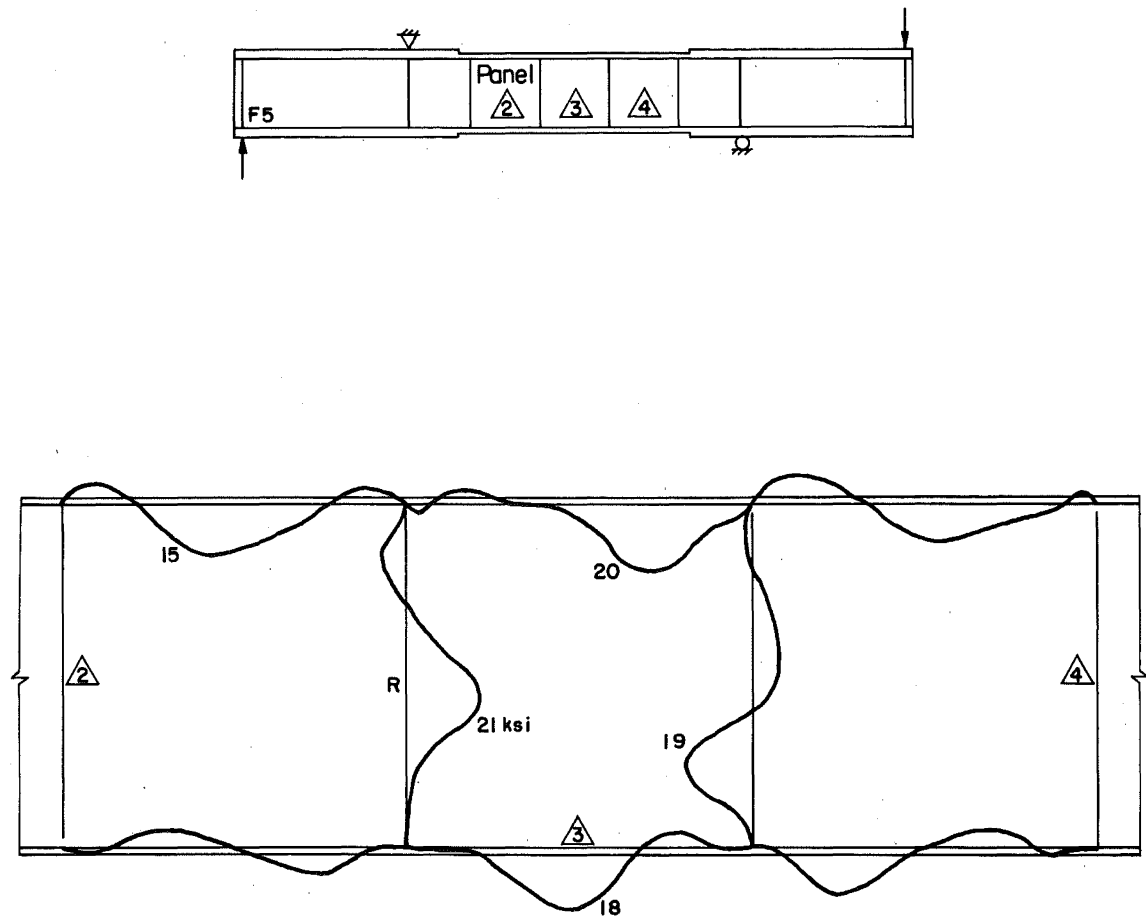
Plate Bending Stresses for a Girder with no Cracks
